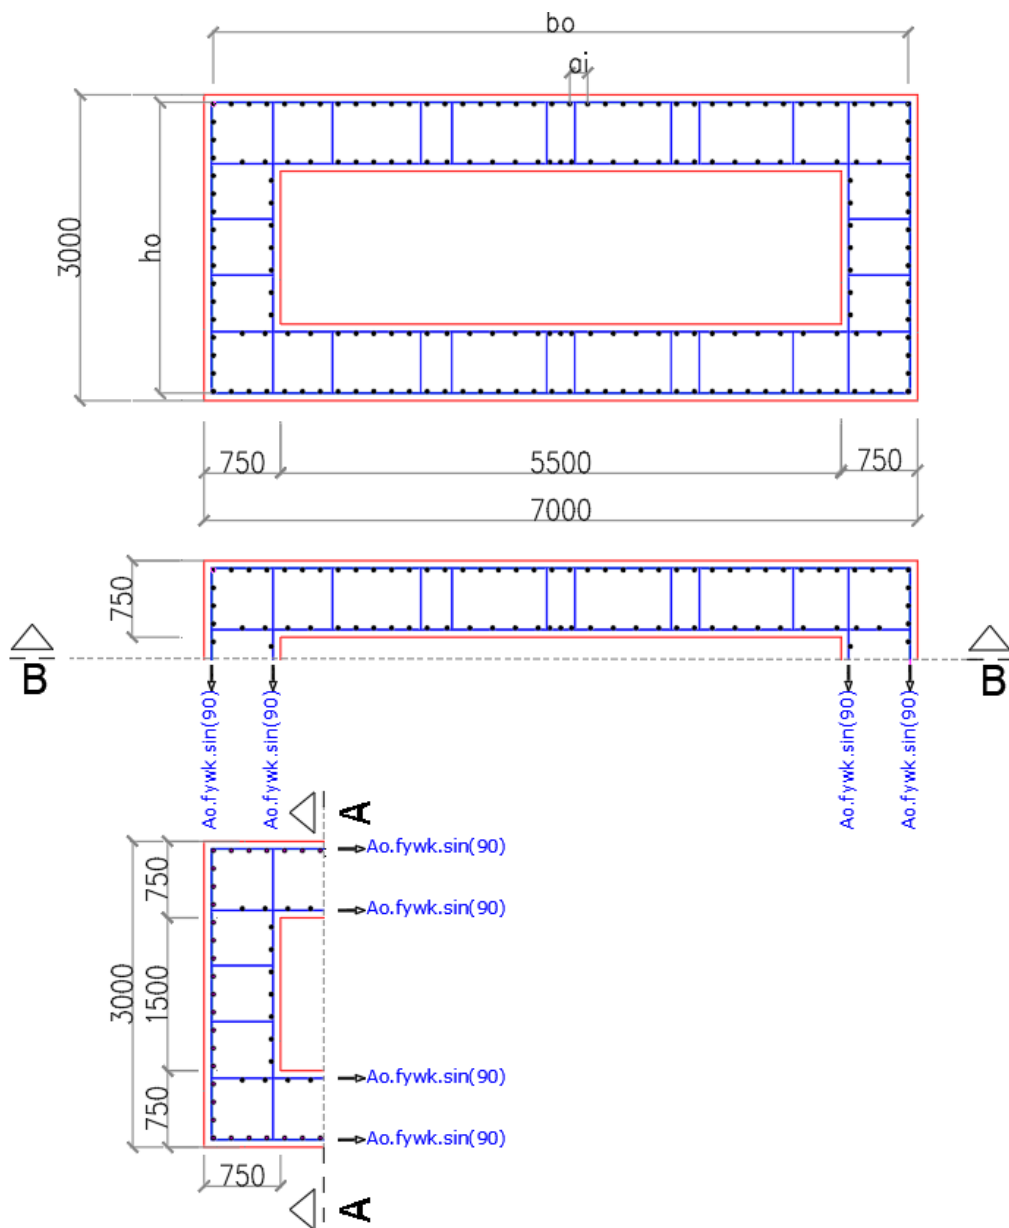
Molla Gürani Pier Column Shear Capacity Calculation
